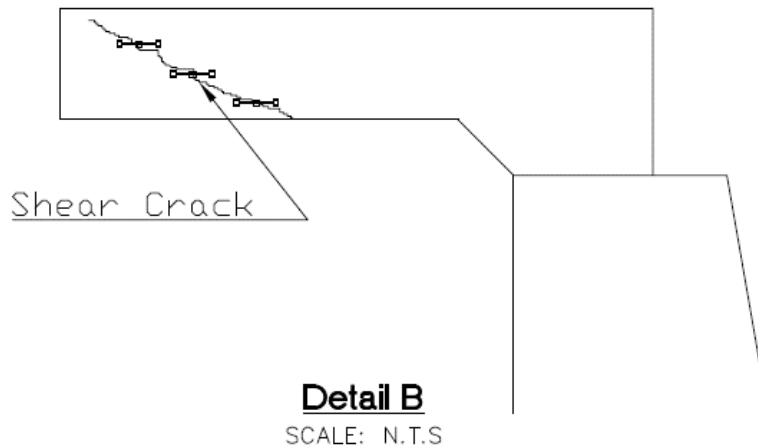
Structure 0118150 – Instrumentation Detail at Possible Shear Crack
